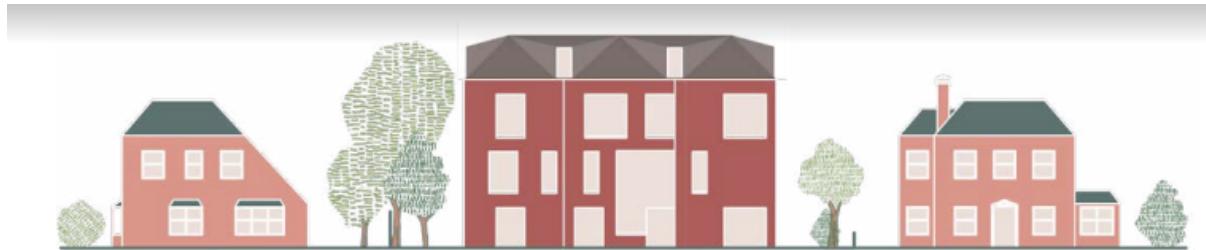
Where surrounding buildings are predominantly detached dwellings of two (2) or more storeys, new developments may be three (3) storeys with an additional floor contained within the roof space or set back from the building envelope below.
